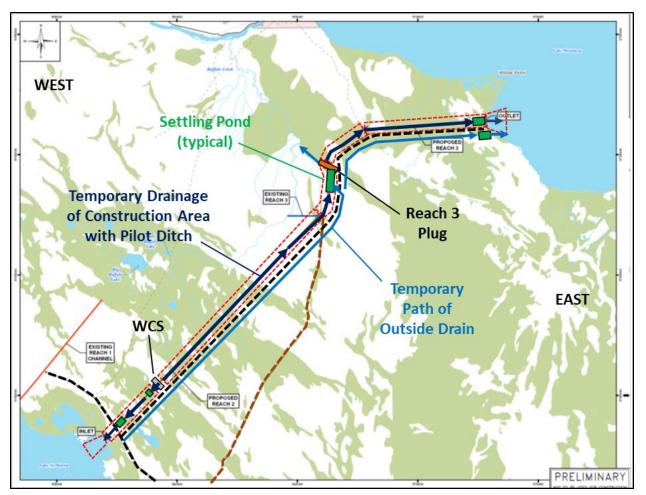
Temporary Drainage Plan with Preliminary Settling Pond Locations
